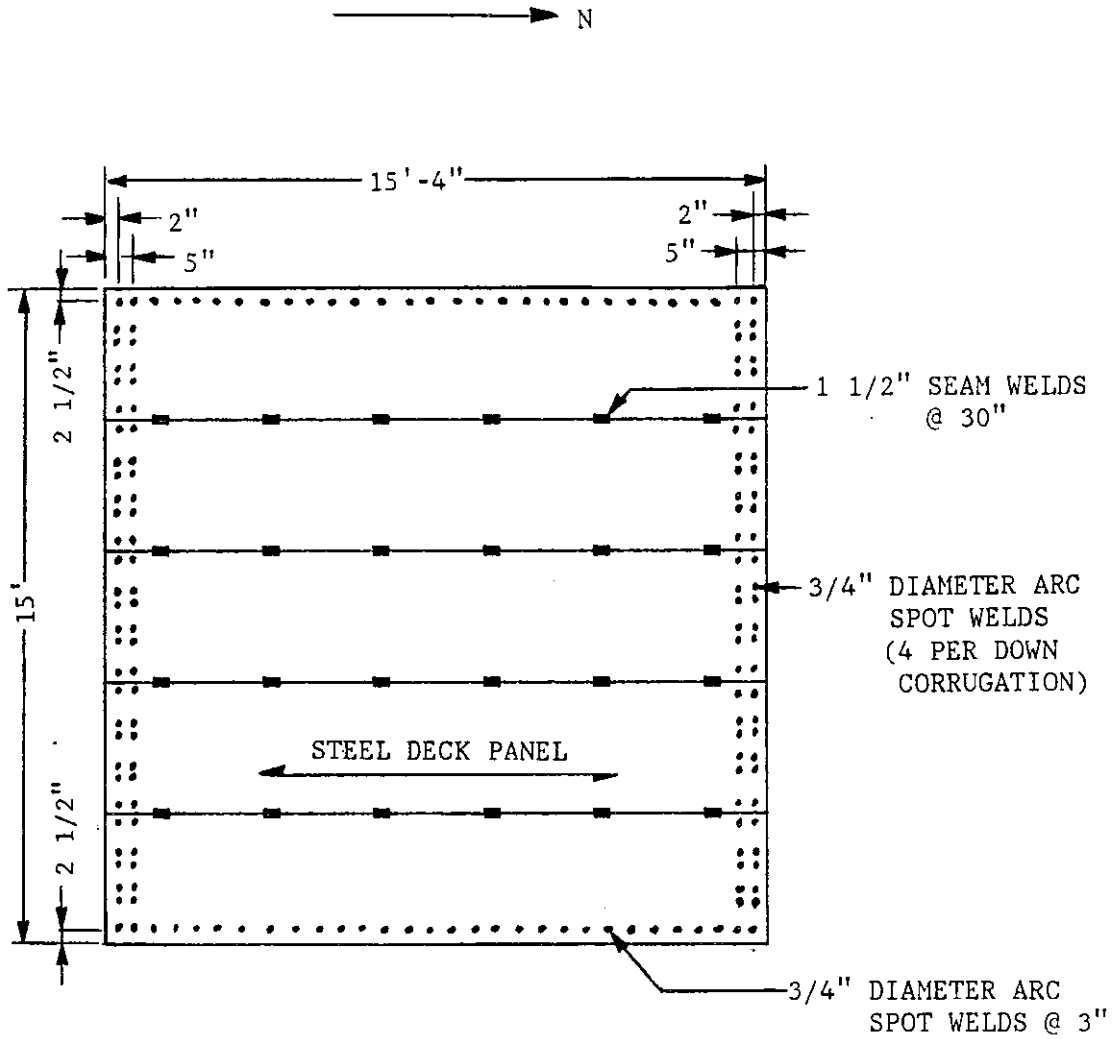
Plan view of edge connector layout for Slabs 9, 10, 12, 13, 14 and 18
